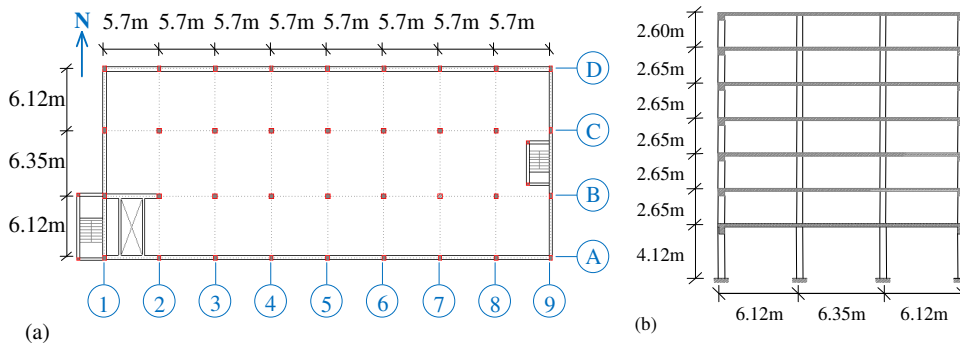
Van Nuys Building: (a) planar view and (b) transverse section
